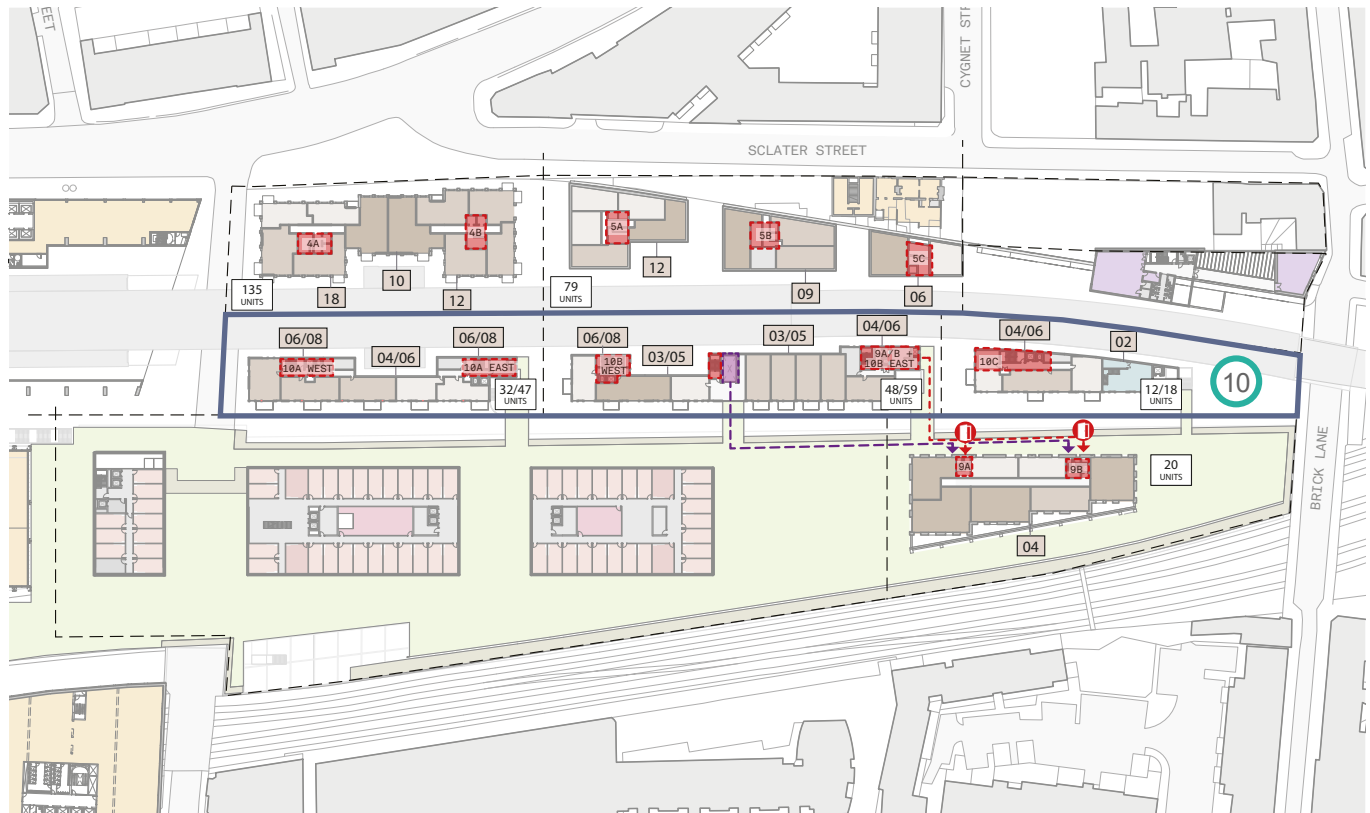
Masterplan typical upper floor (unit numbers and storey heights)
